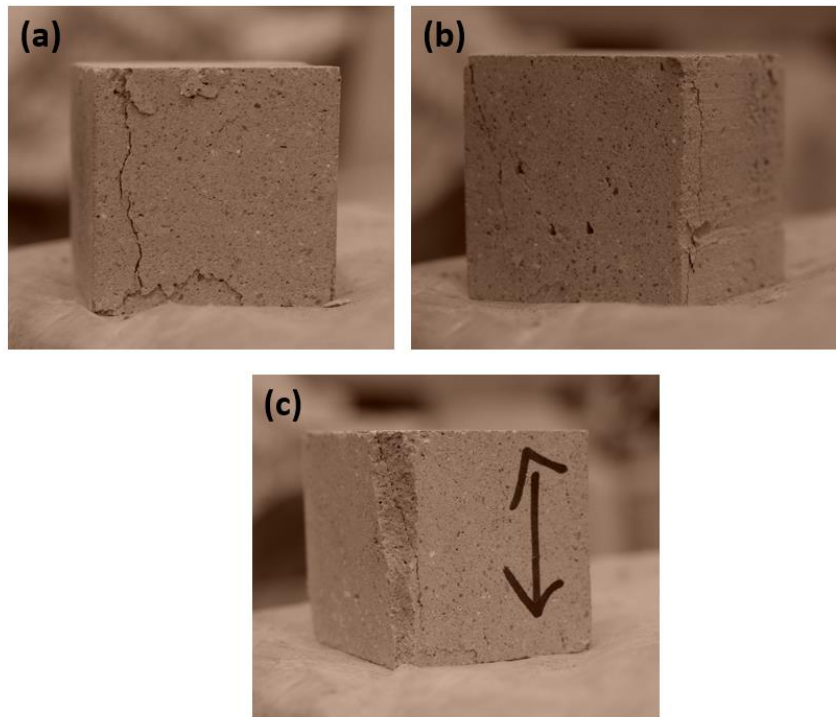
Failure pattern of 3D printed sample (a) F2, (b) F3, (c) F1 after compression
